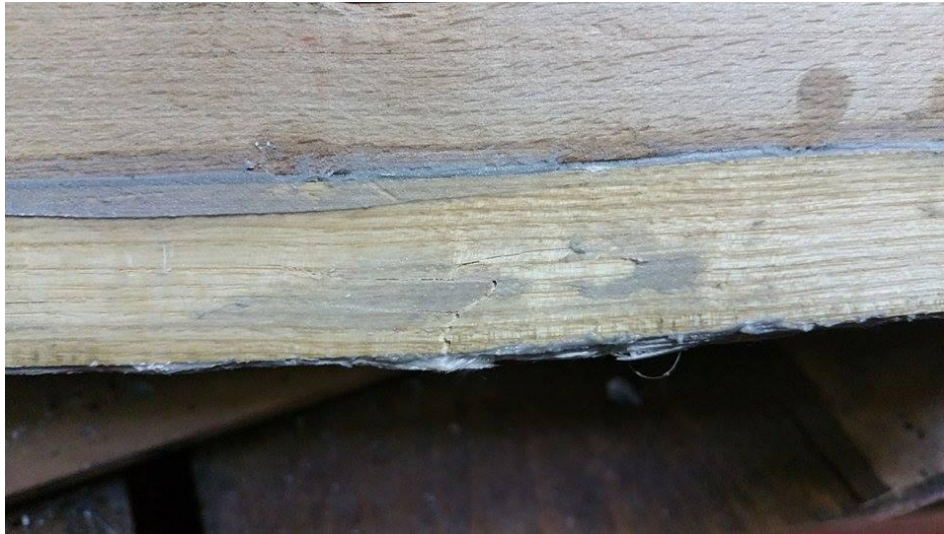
Tension failure of a reinforced wood beam with one GFRP sheet
